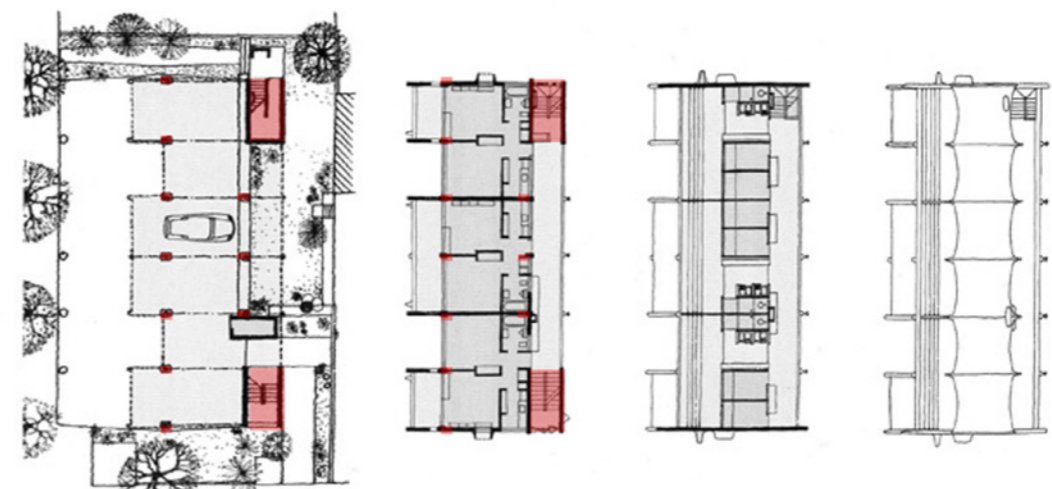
Plans of the Smiling Lion, primary structure highlighted in red
